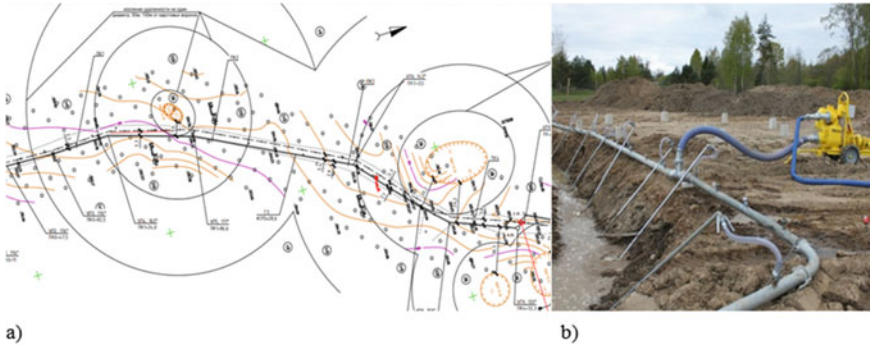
Gas pipeline section: a the plan fragment; b the territory tampering
